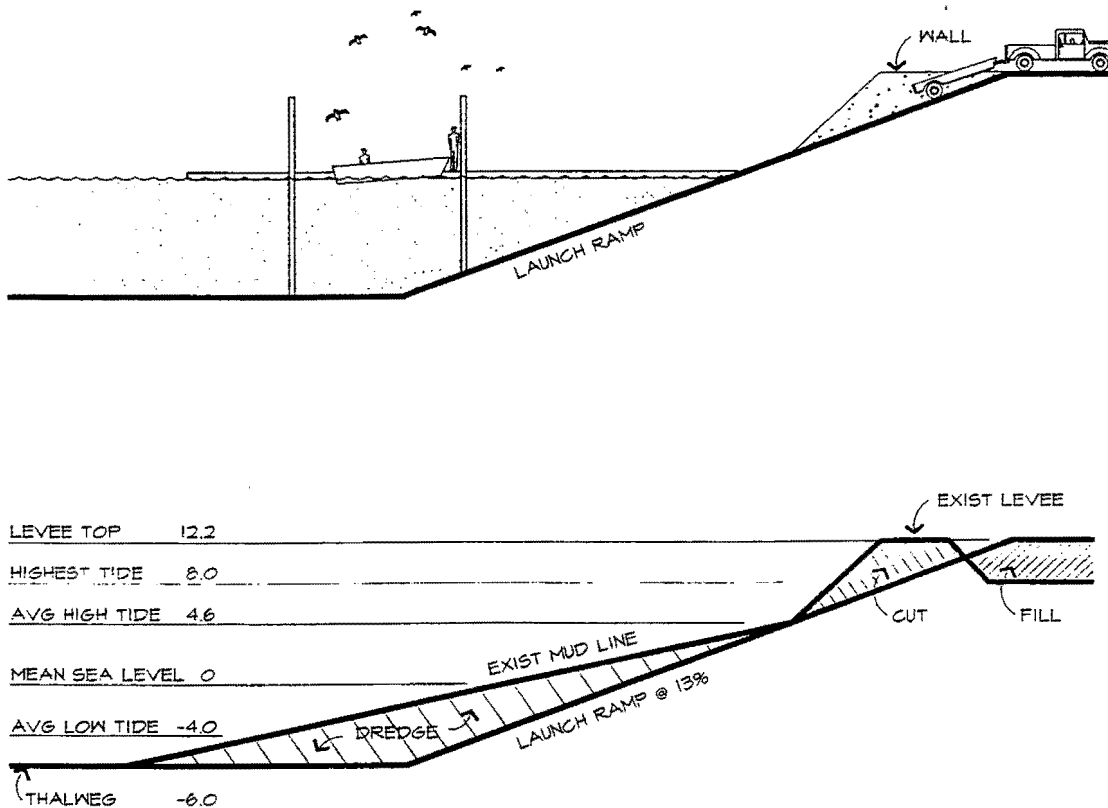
Diagrammatic Sections at Proposed Launch Ramp
